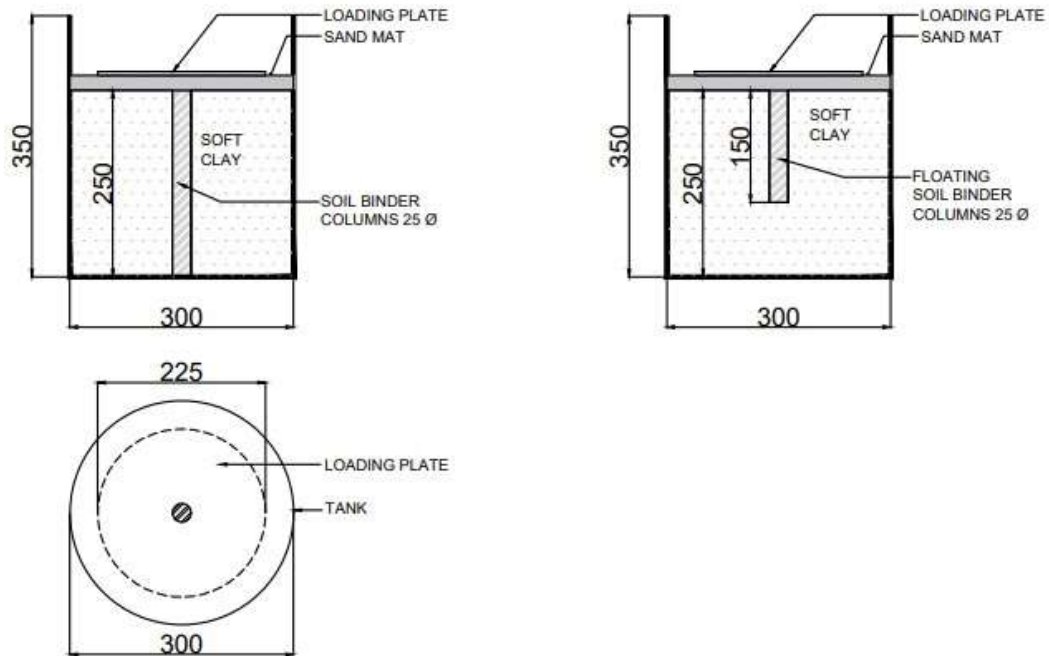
Test details on the improved soft clay bed with single column (a) Section – end bearing column (b) Section – floating column (c) Elevation – All dimensions in mm
